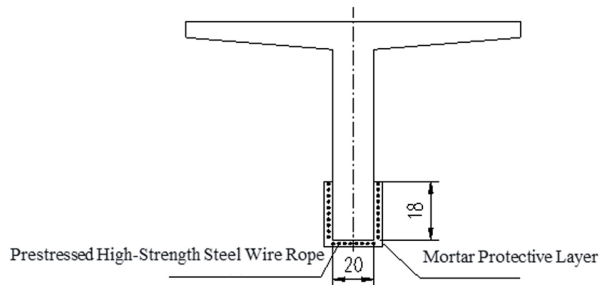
Cross-sectional view of the arrangement on the web (unite: cm)
